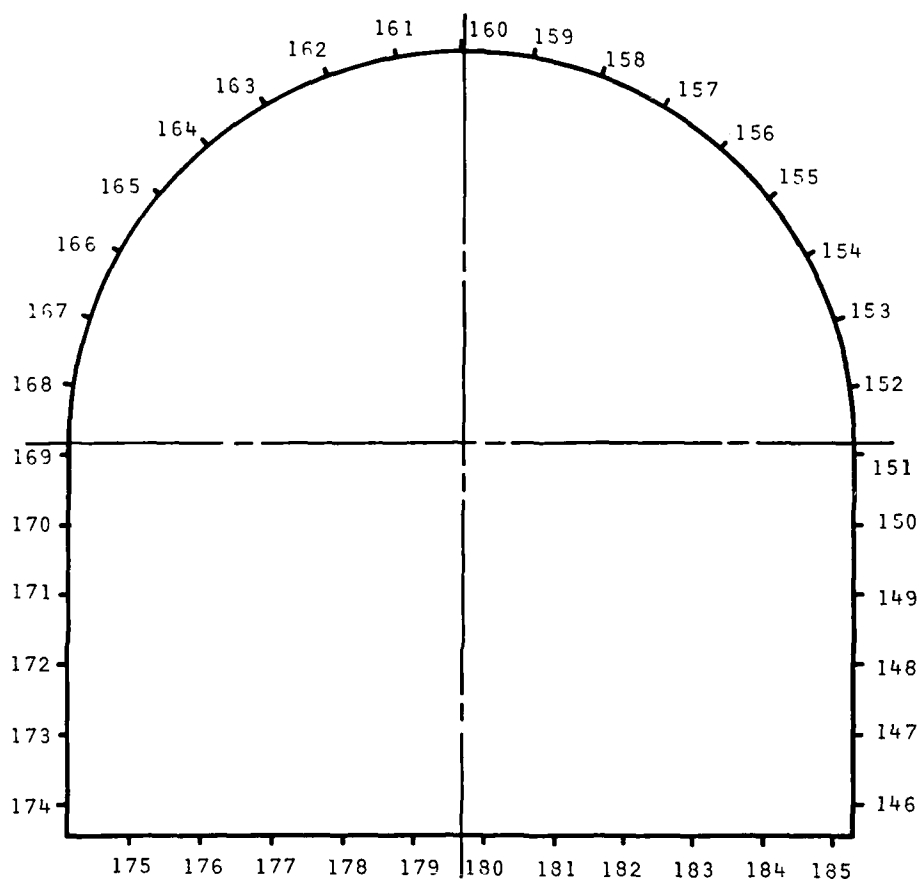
Passive gage point identification at Construction Station 5+62.
